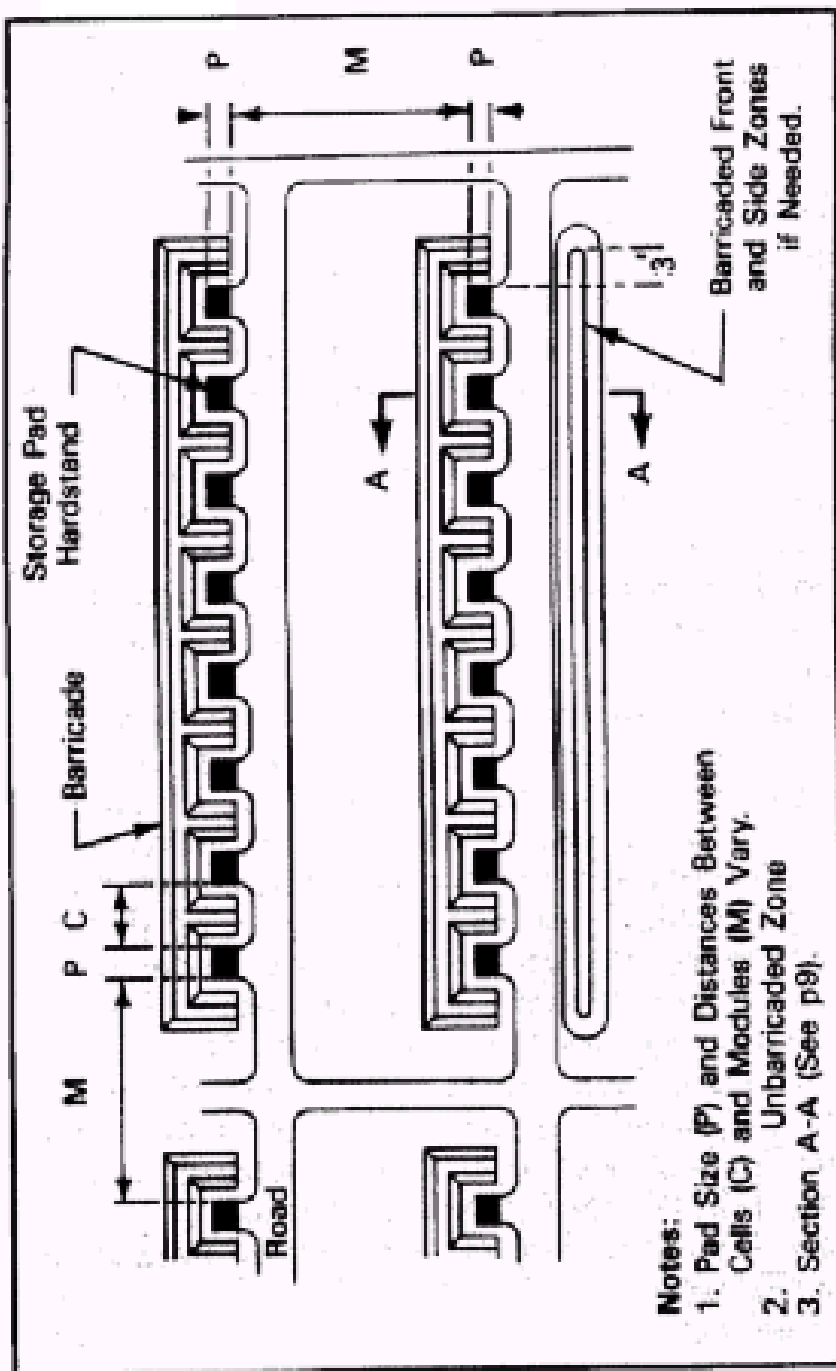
Aerial View of a Typical 8-Cell Module Storage Plan.
